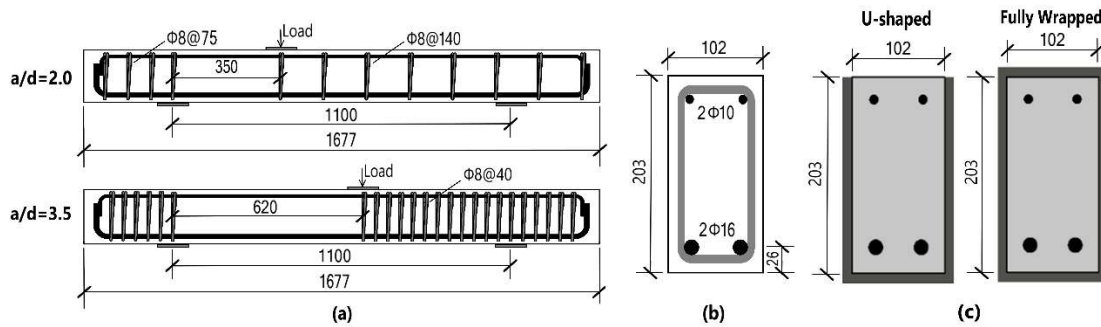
(a) Layout of the reinforcement; (b) Cross section; (c) Jacket configurations.
